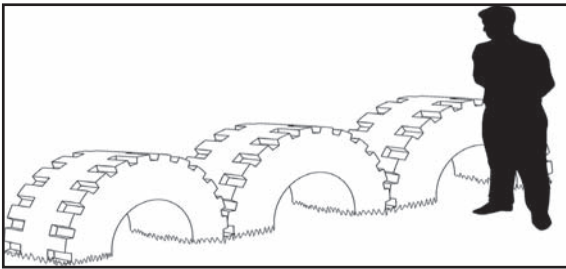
Typical Heavy Equipment Tire Barrier Construction (UFC 4-022-02)
